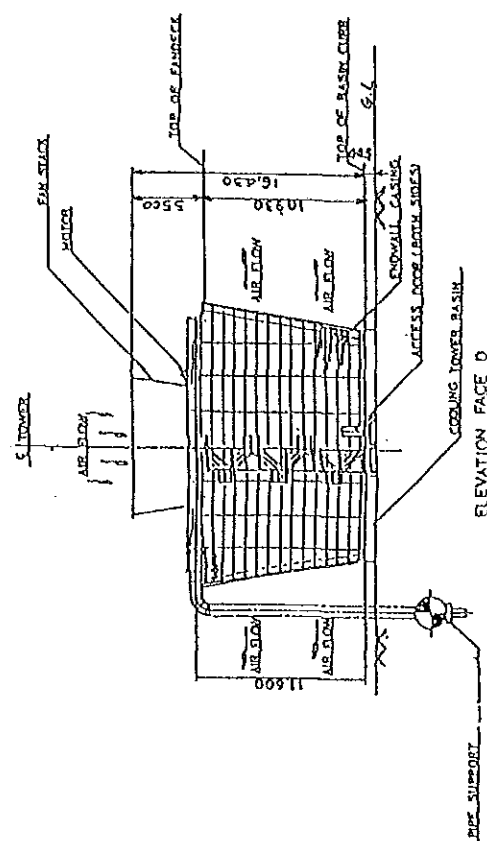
OUTLINE DRAWING OF COOLING TOWER
